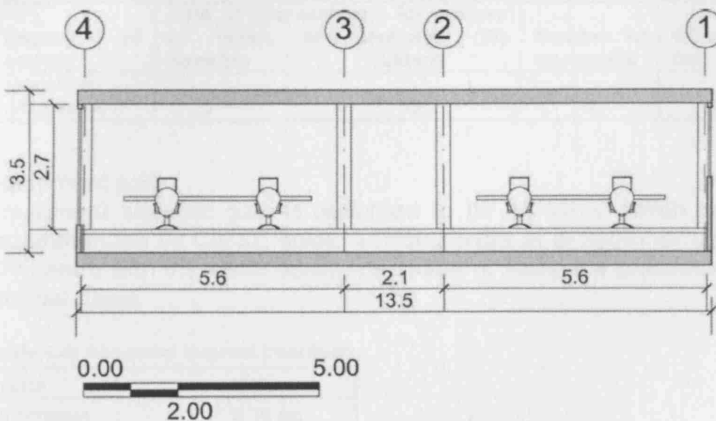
Section B-B of assumed office space (80% glazed area on south façade)
